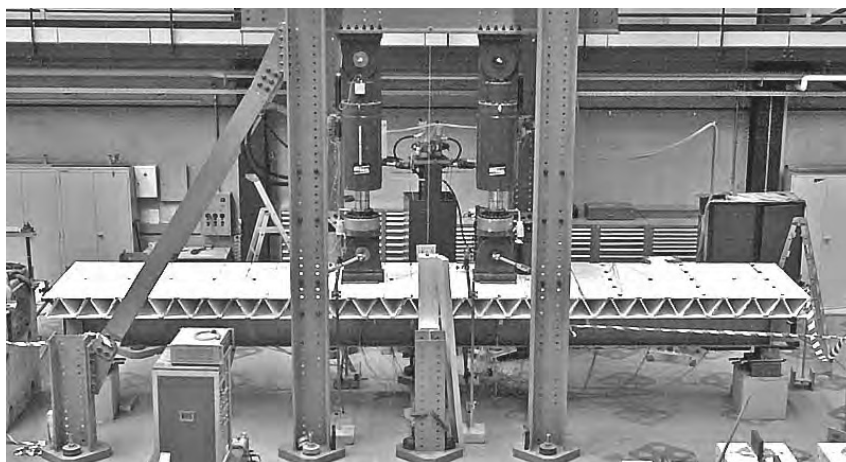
Hybrid bridge girder in four-point bending test [Gür04]
